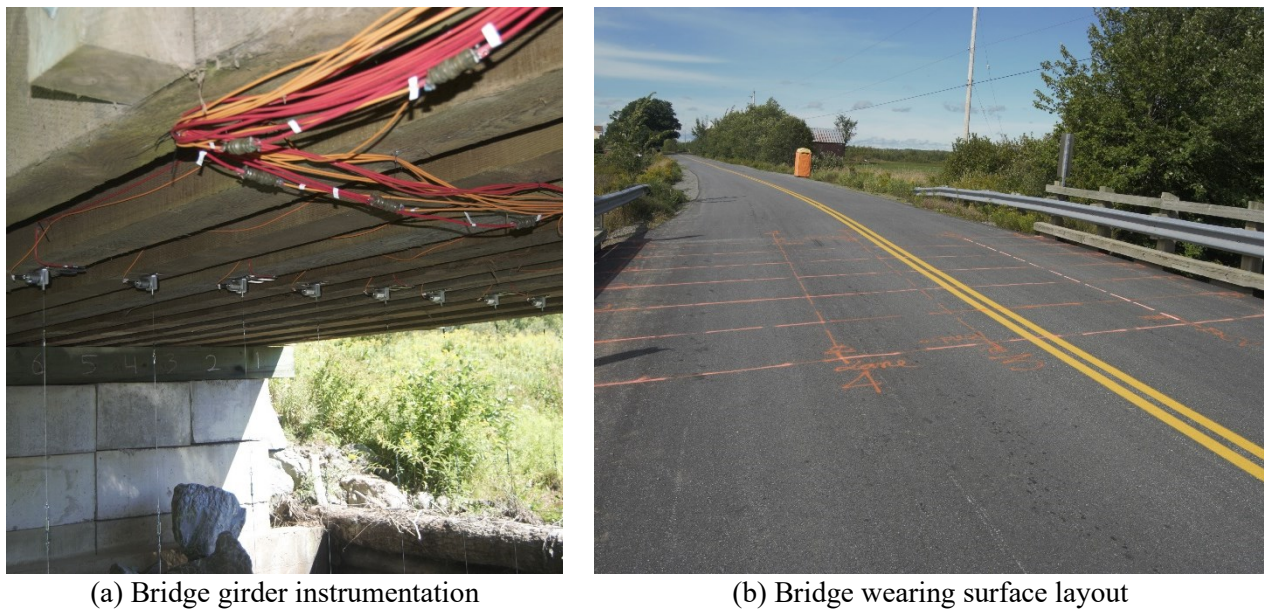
Instrumentation and wearing surface examples from SHM bridge load testing
